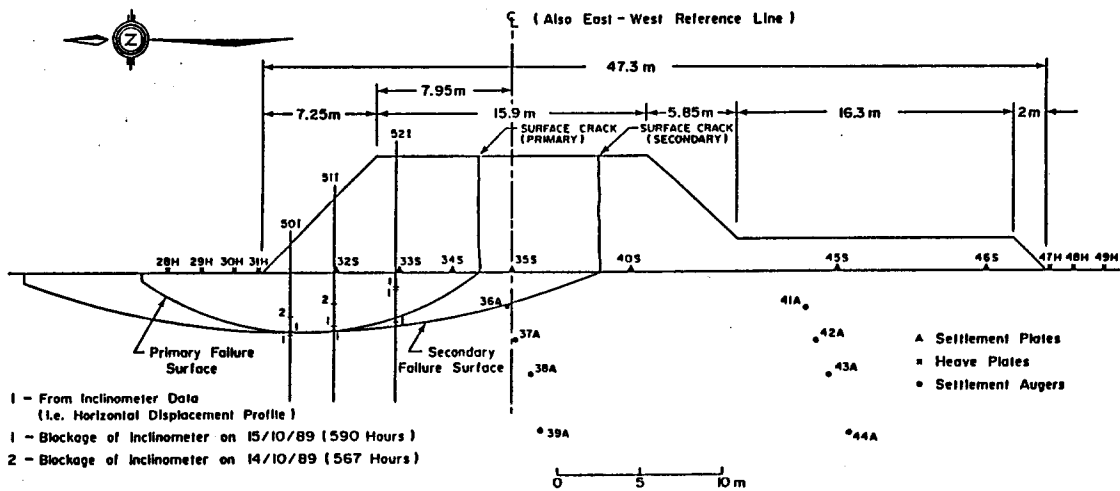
EMBANKMENT GEOMETRY AND INFERRED FAILURE SURFACES: UNREINFORCED SECTION
